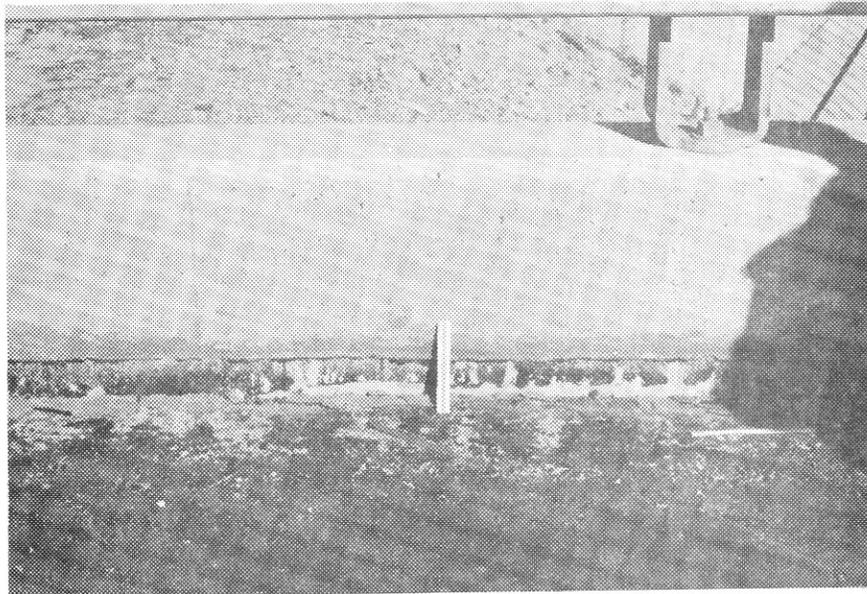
Same location as Photo 95. Note settlement of AC shoulder pavement relative to wingwall.
